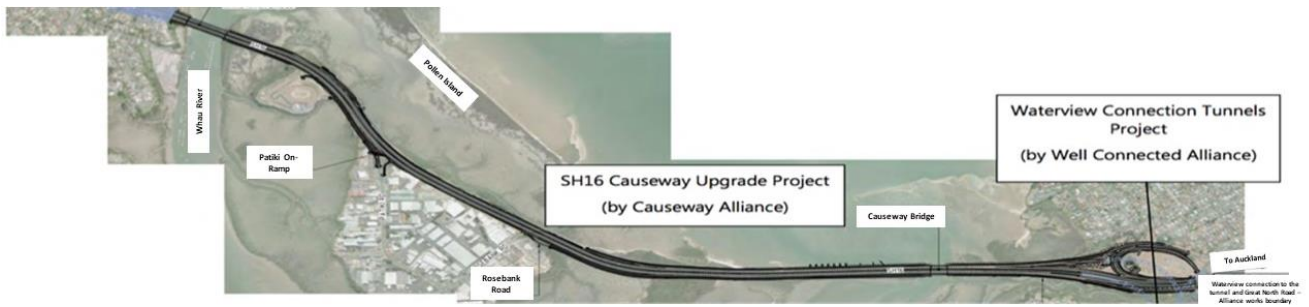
Main Highway Upgrade and Bridge Construction Project master plan (NZTA, 2016)
